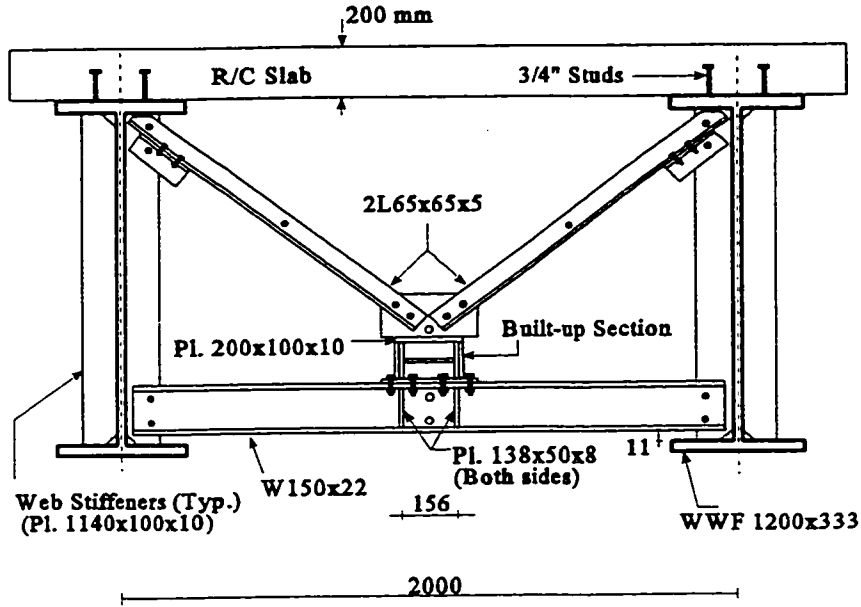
Elevation of ductile end-diaphragm SPS specimen with built-up section.
